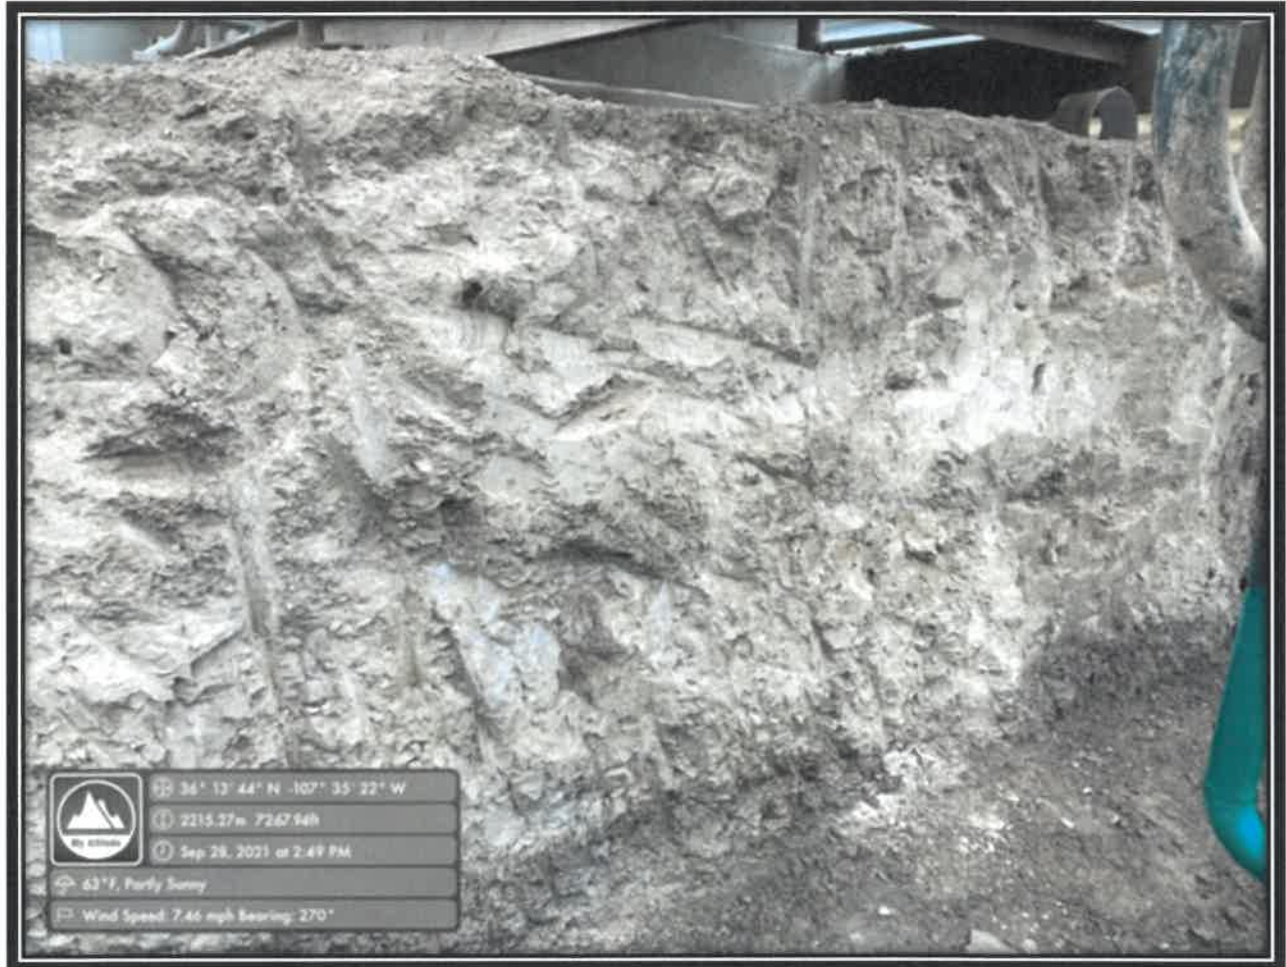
Sampling 9/23/2021 Looking at West Wall and Bottom
